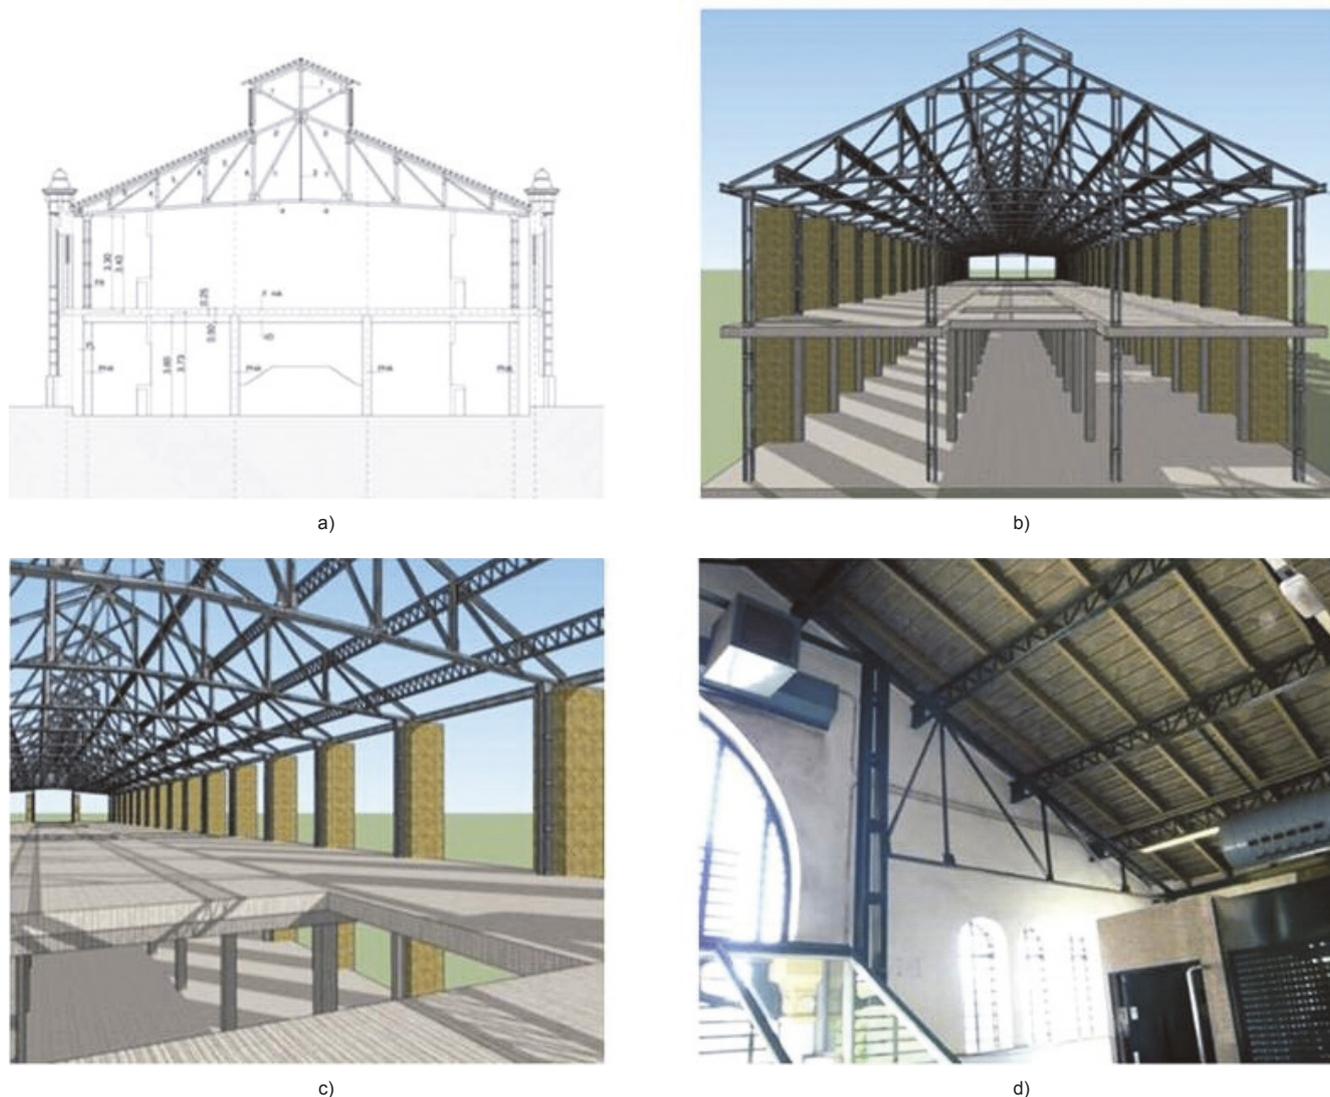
Modified structure: a) Elevation view; adapted from (10); b) and c) 3D modelled details of the entresol and its supporting members; d) Real detail of the steel frames connected to the front walls.
